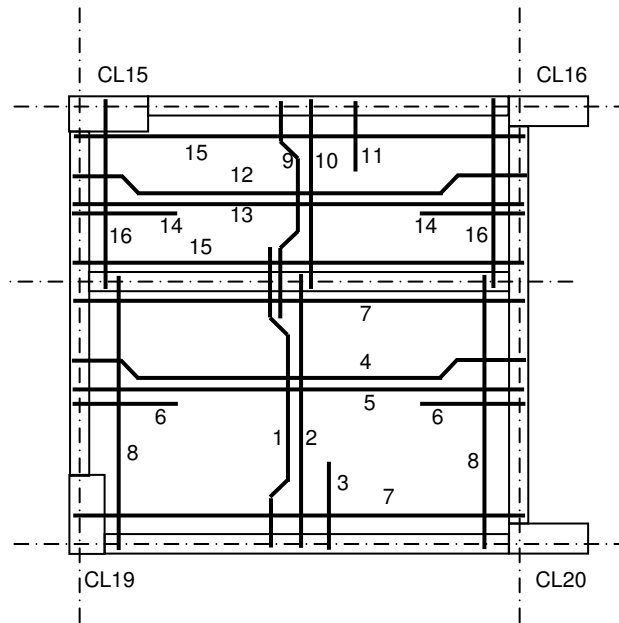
Reinforcement Details for Floor/Roof Slab
